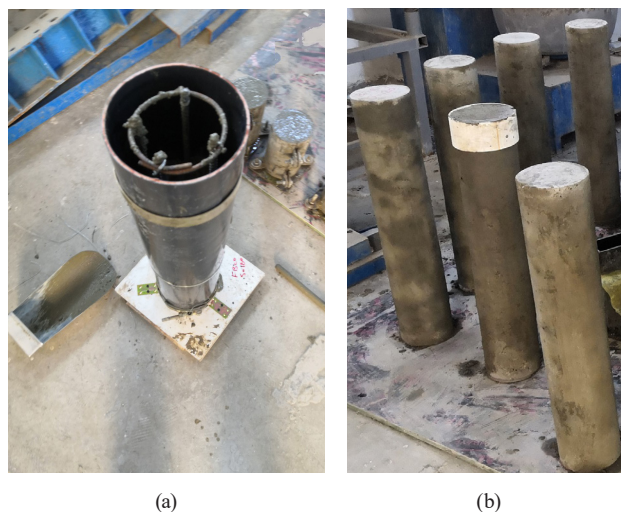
(a) Casting concrete into the mold, (b) columns after demolding
